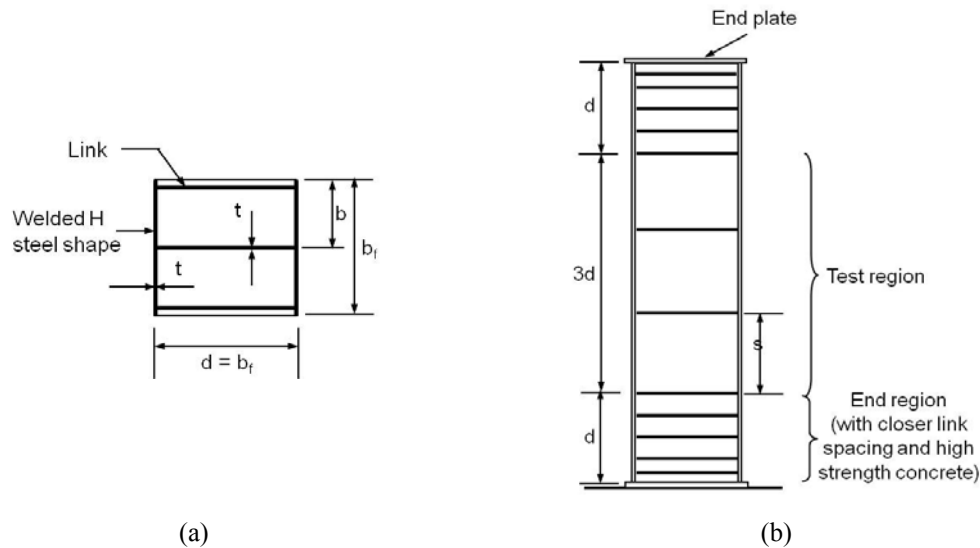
Typical PEC test column: (a) cross-section; (b) elevation
